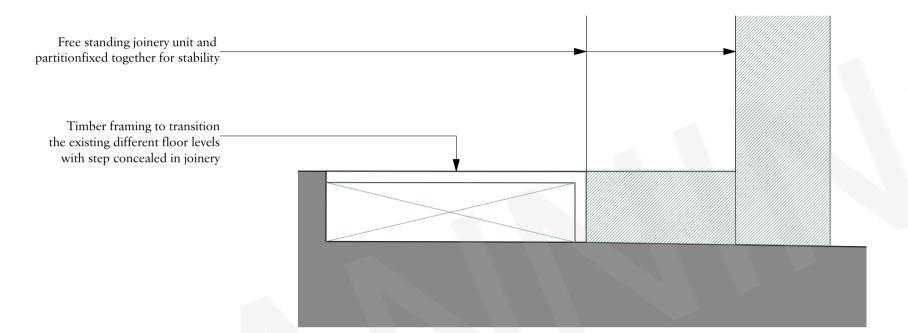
JOINERY ROOM DIVIDE HEAD
